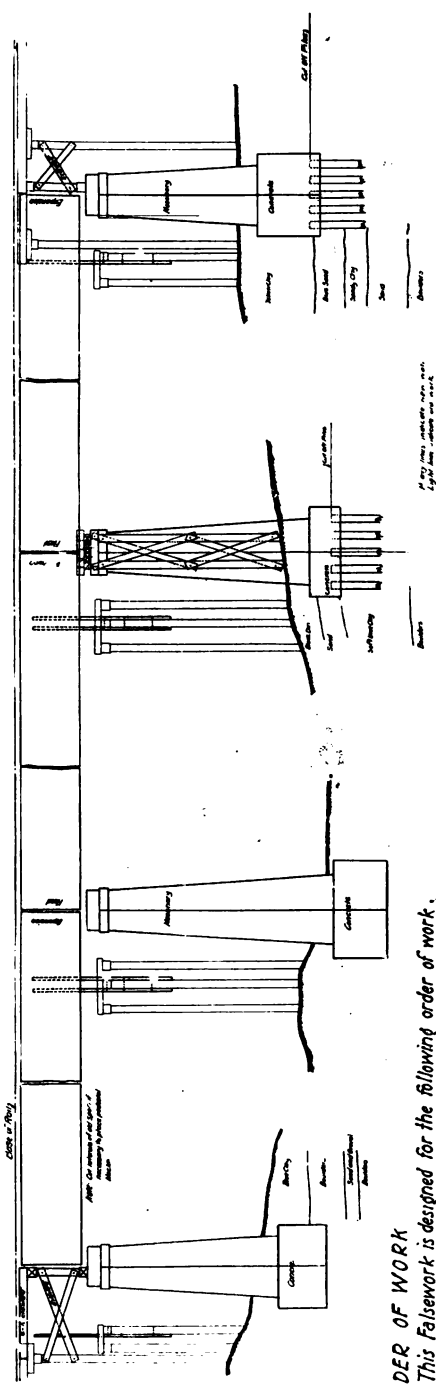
General Erection Plan, for Ballast Floor Deck Plate Girders, C. M. & St. P. Ry.
